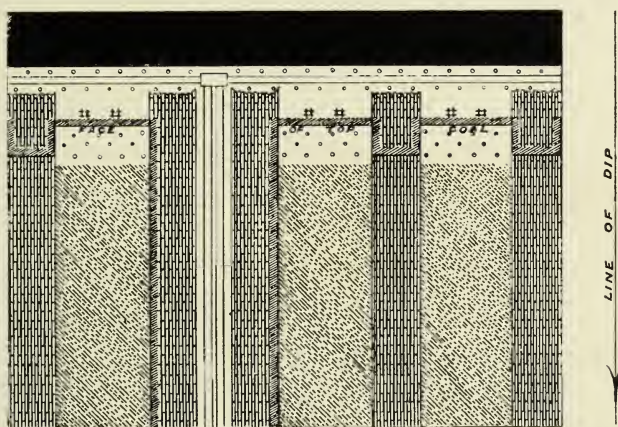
GREAT FENTON COLLIERIES, STOKE-UPON-TRENT. PLAN OF LONGWALL FACE IN THE GREAT ROW COAL SEAM, SHOWING PROPS AND CHOCKS.
